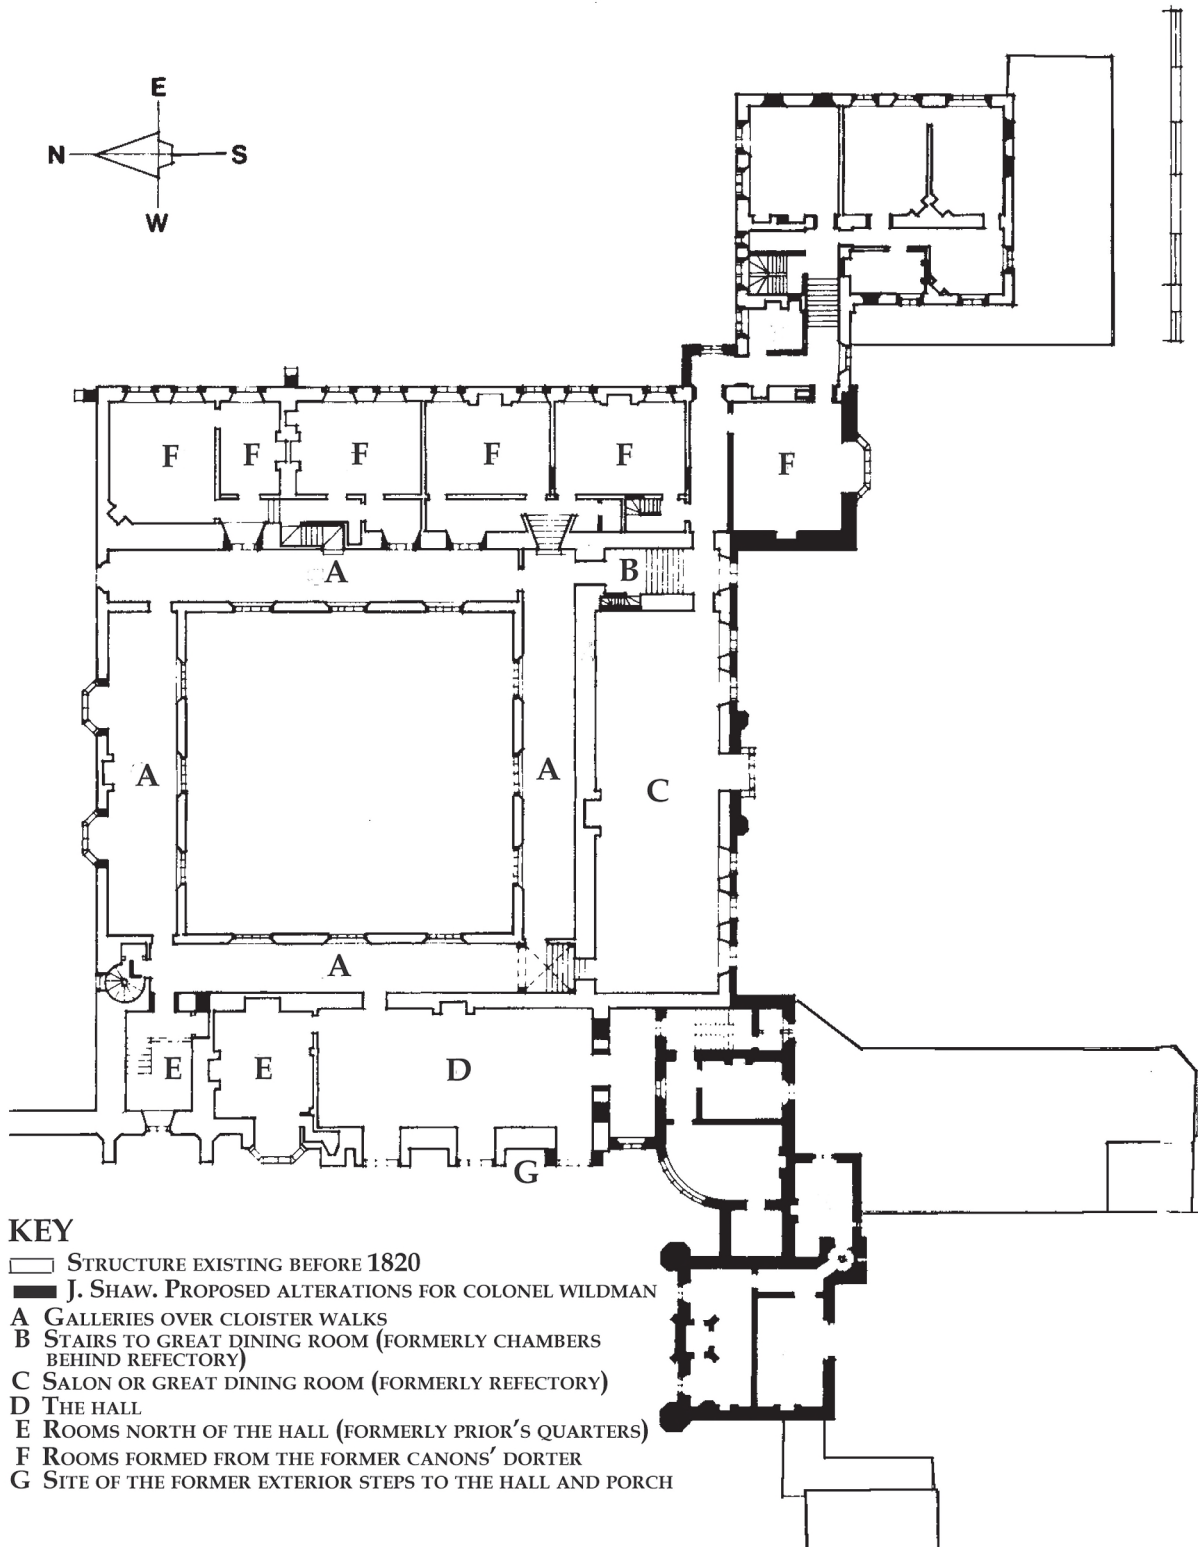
Newstead Abbey: Plan of the first floor, 1818/19, after John Shaw.
